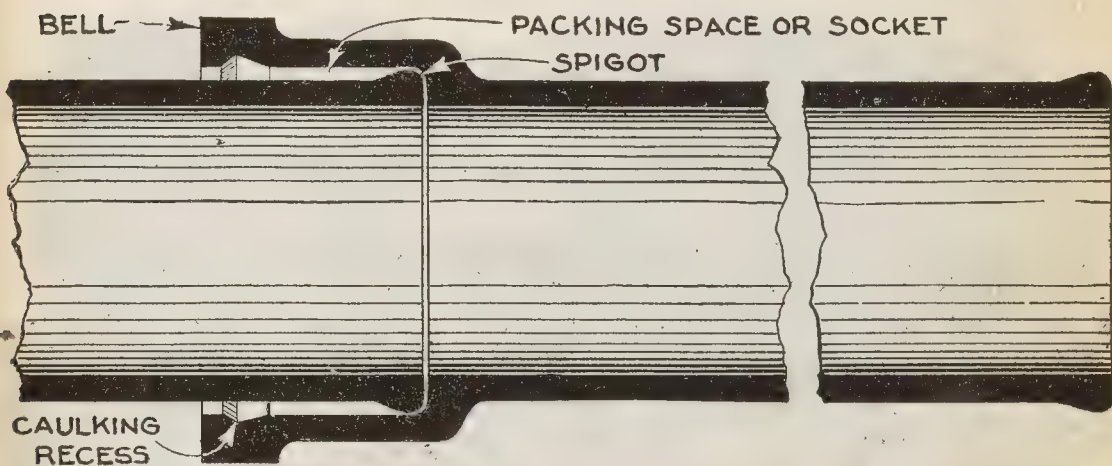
,788.—Bell and spigot joint as used for connecting lengths of cast iron soil pipe.
